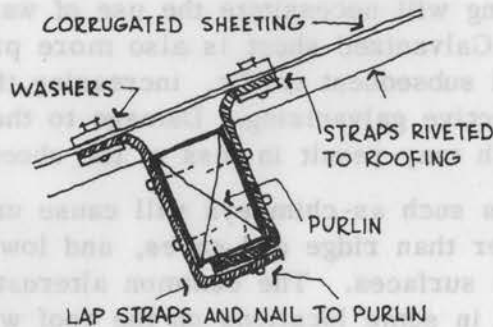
CORRUGATED SHEETING—FIXING TO PURLINS WITH STRAPS
